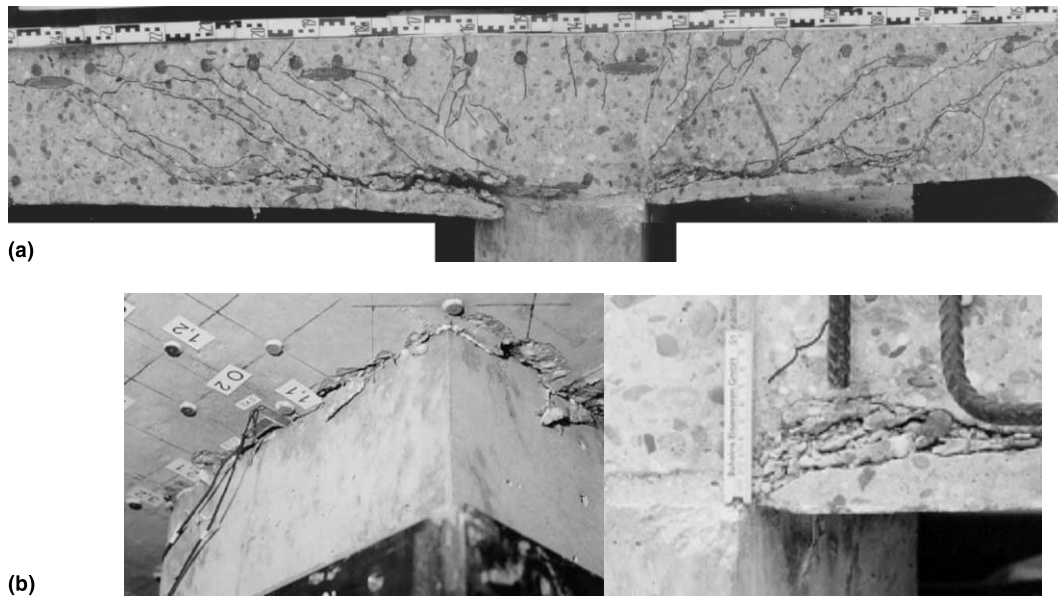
P7-I: crack formation in a saw-cut after failure and concrete crushing at the column face at ultimate load: (a) saw-cut with a multiple shear crack formation in the punching zone; (b) concrete crushing of the compression zone at the column face.
